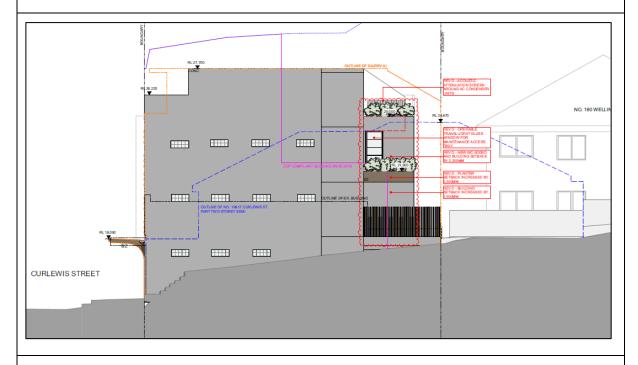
(above): West elevation of proposal in current review application in DA-320/2018/1 (Source: applicant)
